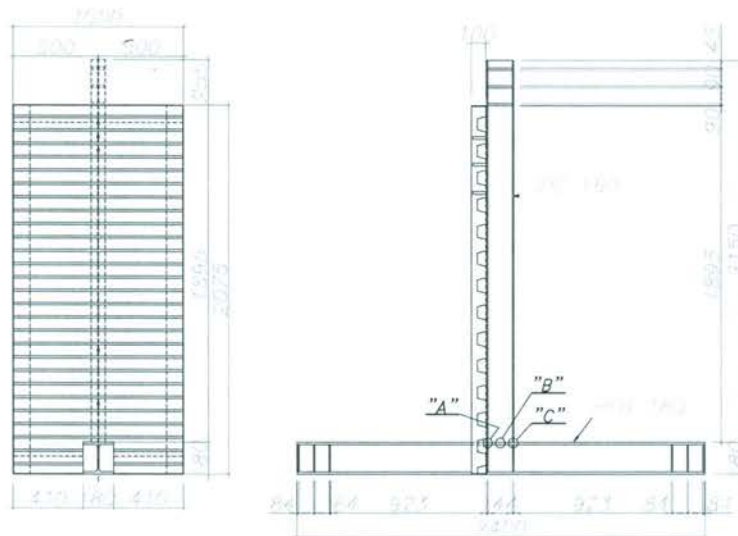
Specimen of steel beam-to-column joint with the concrete slab on metal sheeting
